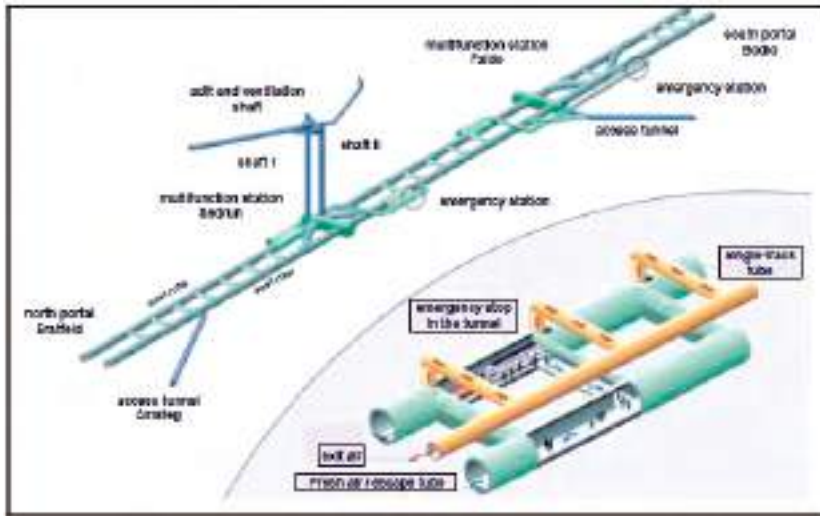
Gotthard Base Tunnel, tunnel system and emergency stop
